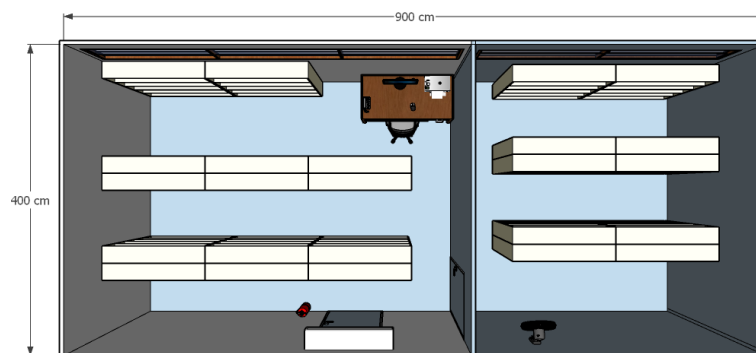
Layout Plan for the New Medical Record *Filing* Room
